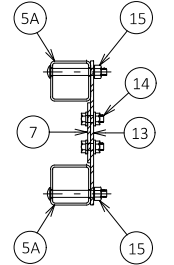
DETAIL AT END POST THRIE BEAM RAIL ATTACHMENT
